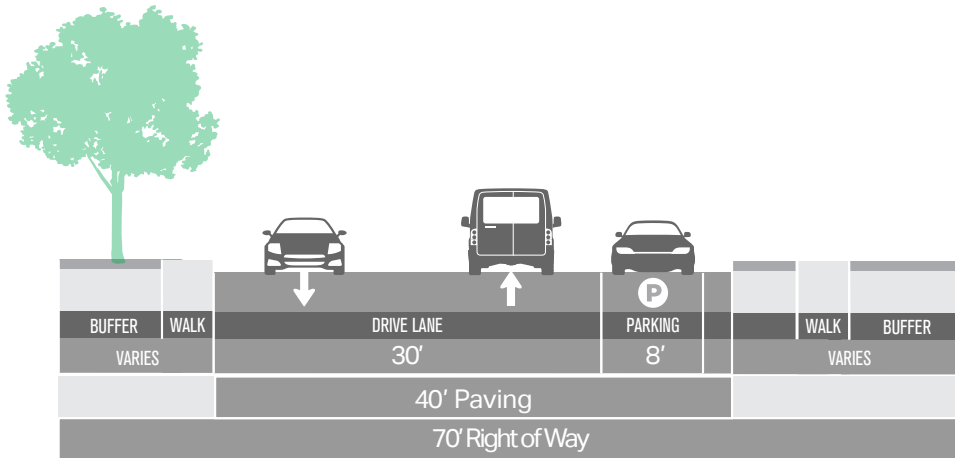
Existing Typical Edwards Street Section with Permitted Parallel Parking
